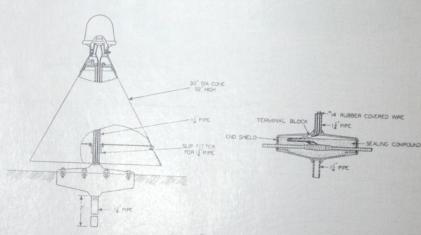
Installation Details of Multiple Boundary Light With Type UGA Underground Junction Box
